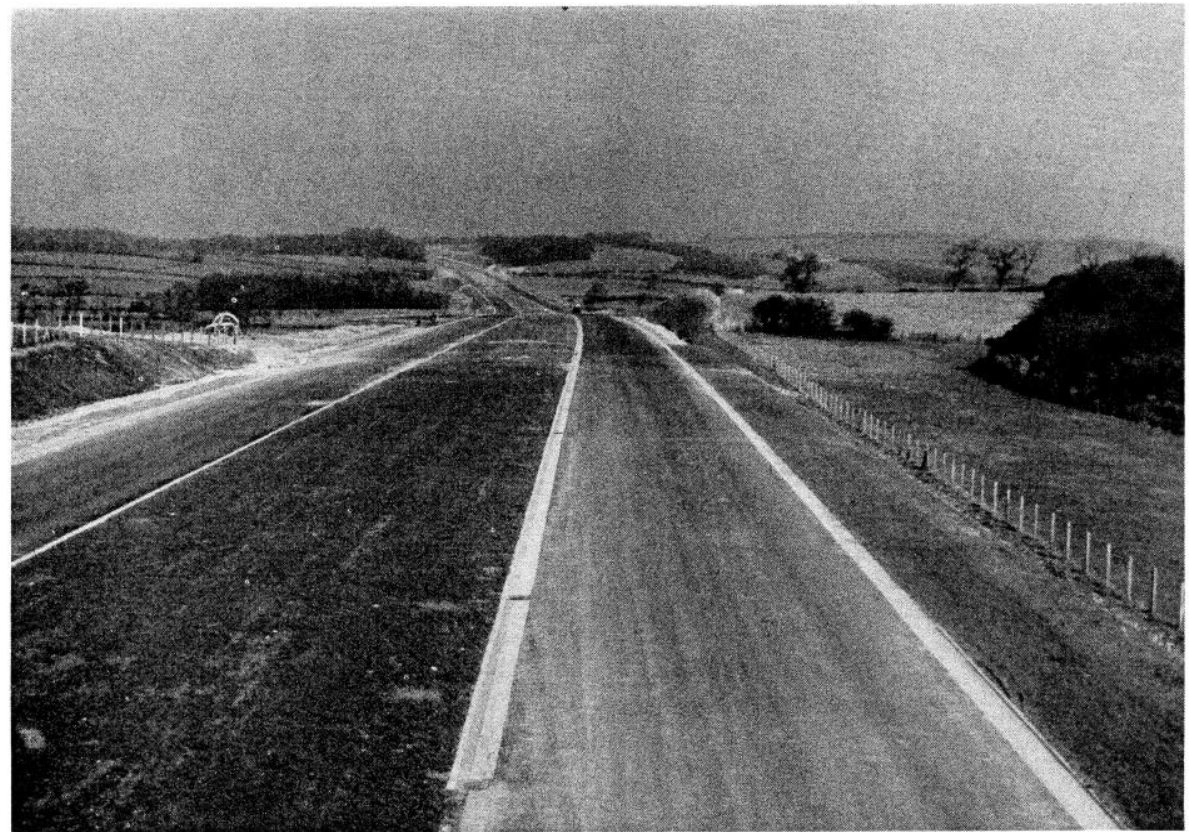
VIEW OF MOTORWAY, LOOKING NORTH FROM COCKSHADES FOOTBRIDGE TOWARDS BAILRIGG.
